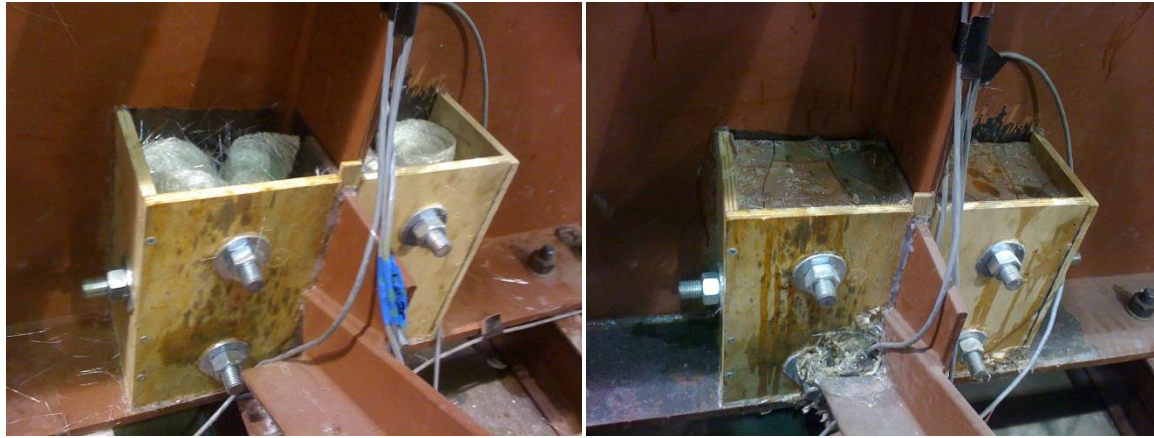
7 View of the interior of the girder segment: a) FRP block formed; photograph taken prior to casting the WEST resin; b) Cured FRP blocks.
